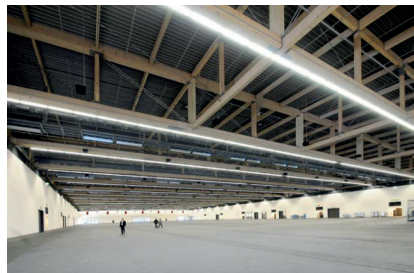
Roof structure of an exhibition hall realized as trussed system
